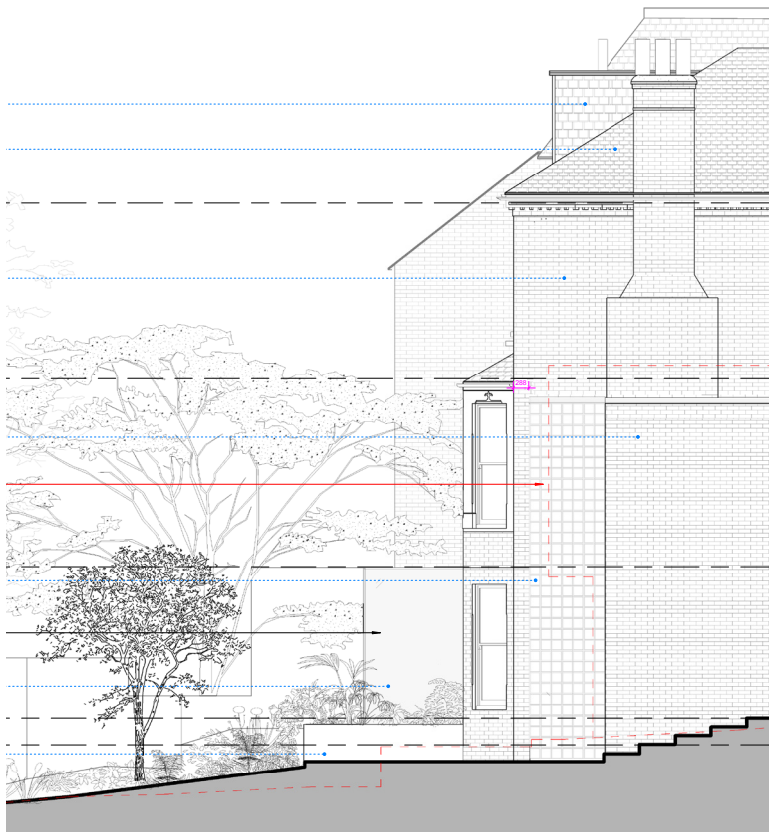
Previous South Elevation with fully glazed extensions and glass block facade
